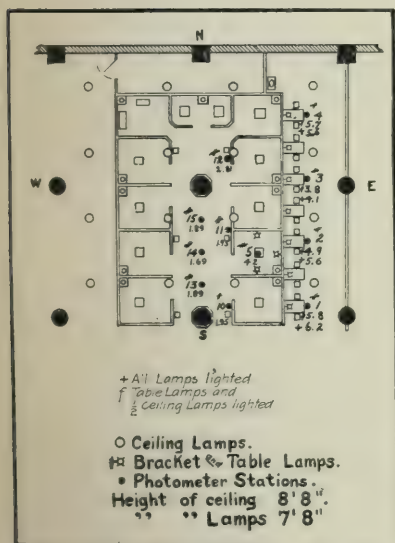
Section plan of main floor mezzanine, showing location of hair-dressing and manicuring parlors, lighting units, test stations and illumination data.
